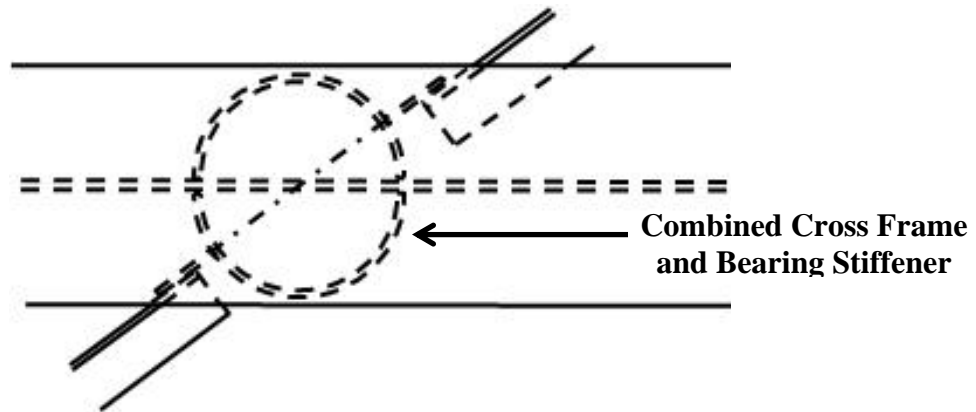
Plan View of Half Pipe Stiffener Detail
